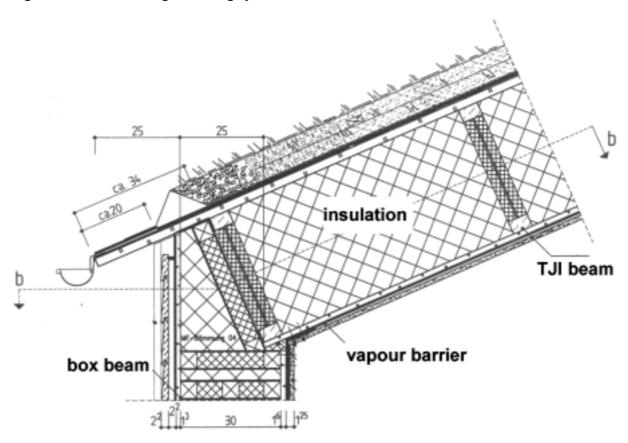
Thermal-bridge-free eaves junction of the roof element to the facade element
